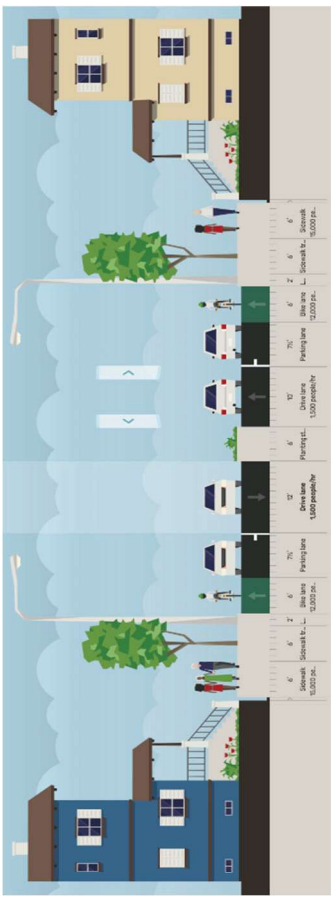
Sample Complete Street Cross Section w/Parking Lanes as Buffers from Bike Lanes
